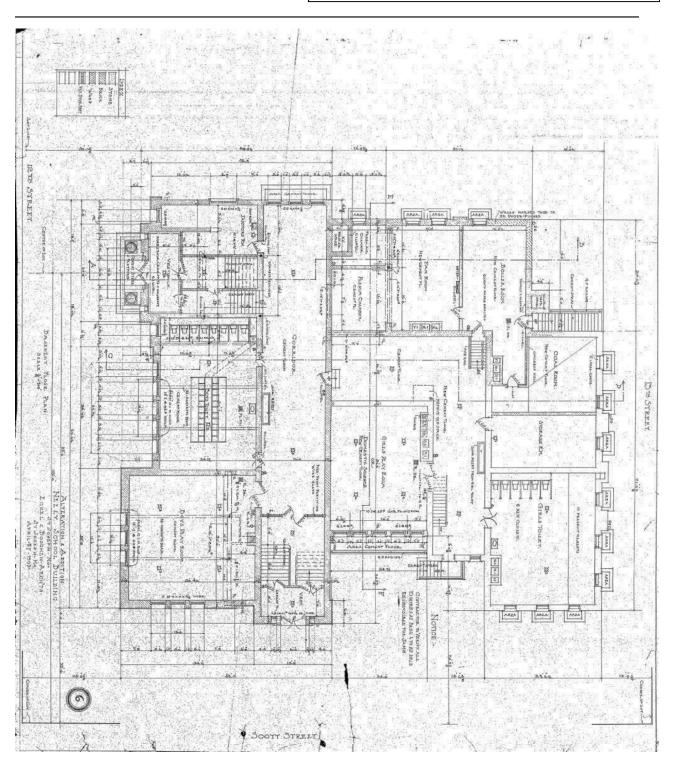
Eckel and Boschen Architects, Basement Plan, April 1909 (Architects 1909)
